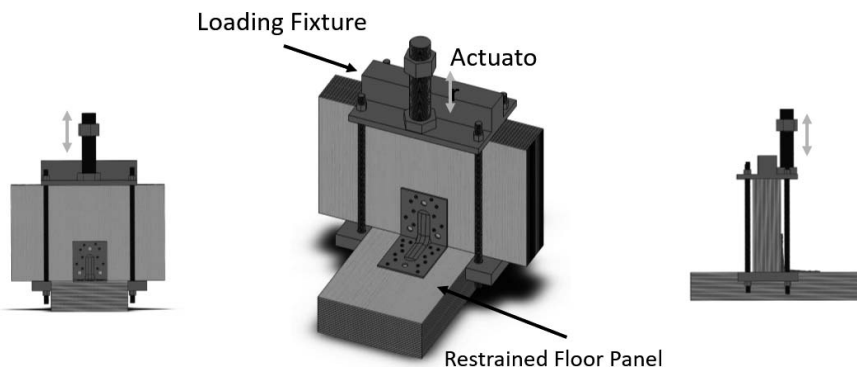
Testing setup in the withdrawal direction without clamping of the floor panel.
